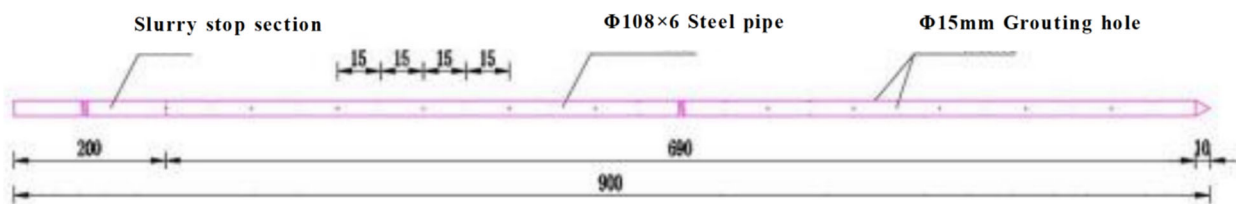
Construction sequence diagram of steel sleeve valve tube reinforcement of inverted arch foundation
